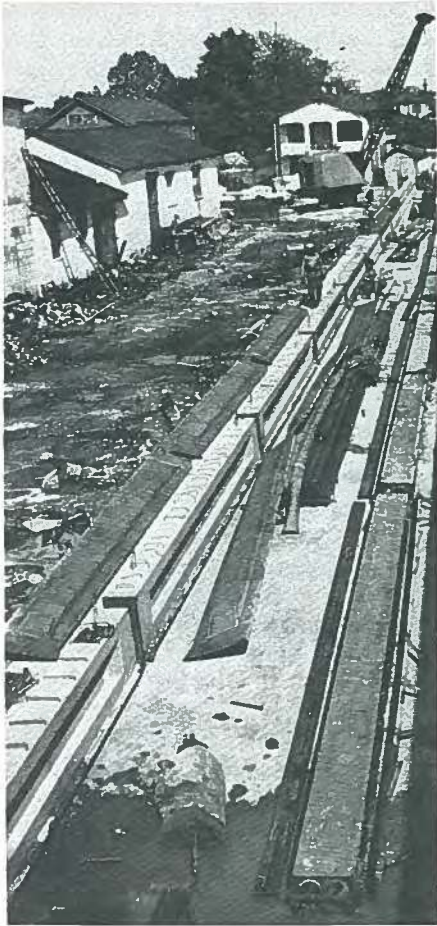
Pretensioned bonded "I" section girders at casting plant in New Orleans for the production of girders for Loyola University's stadium about 1953.
